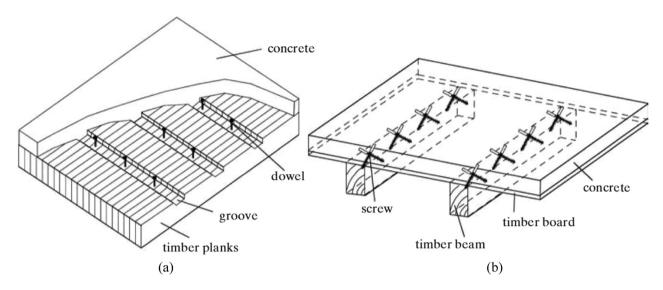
TCC flooring design: (a) slab-type floor and (b) beam-type floor [25].
